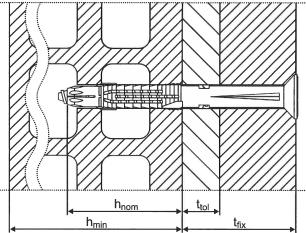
Installed anchor in hollow masonry in bricks (h<sub>nom</sub> 70 mm, > of the dimension of the hole)
